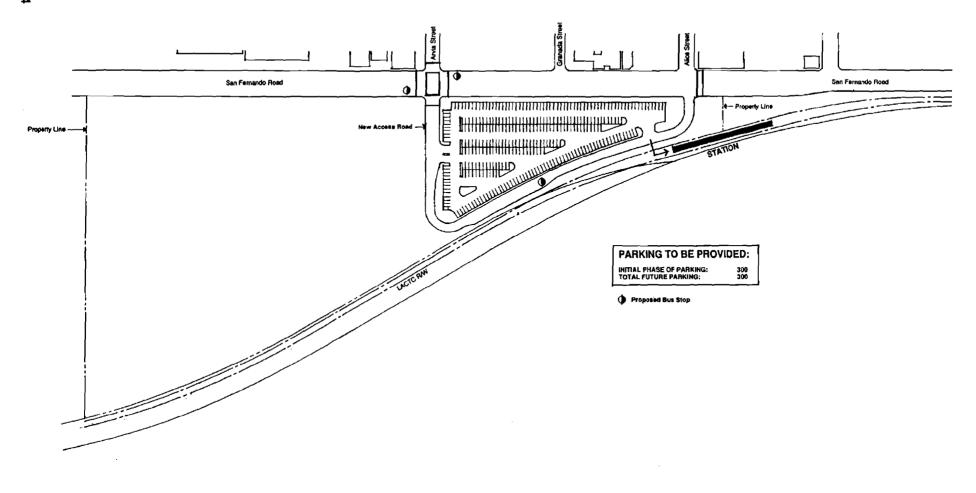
(page 34) illustrates the proposed station site plan for Taylor Yard. The station's configuration reflects a collaborative venture to coordinate design with Taylor Yard planning efforts (pedestrian orientation and development of a station plaza) and Los Angeles Department of Transportation (LADOT) street widening requirements (upgrade of San Fernando Road to a major arterial standards on the project-side of the street).
